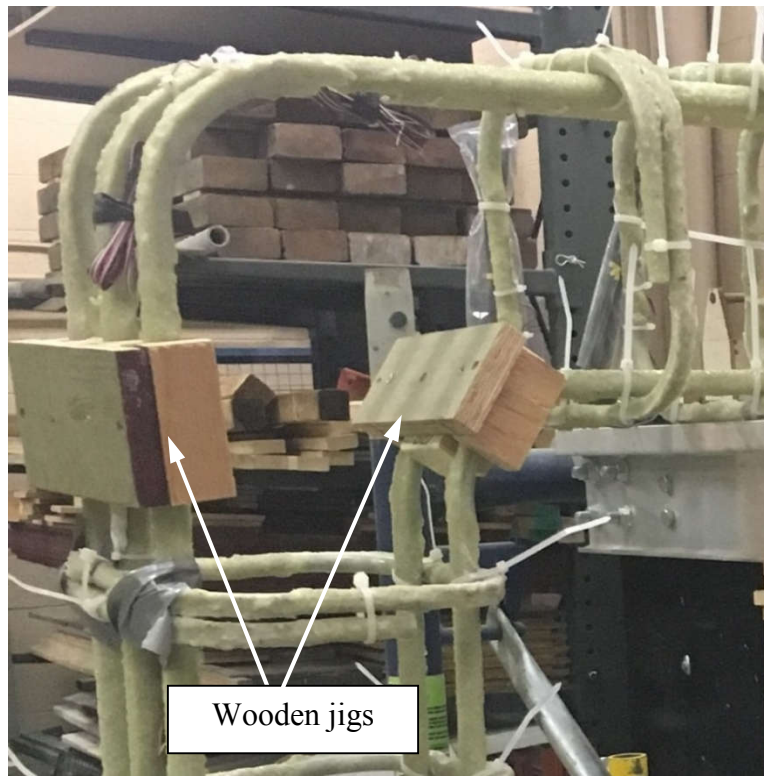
Separating Reinforcement Bars Using Wooden Jigs
